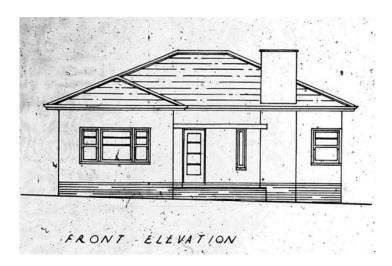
Front façade of 41 Hortense Street from the 1945 building permit plans. Note the sash window on the right-hand side, now replaced by fixed glazing. (Source: City of Camberwell, BP No. 16912)
